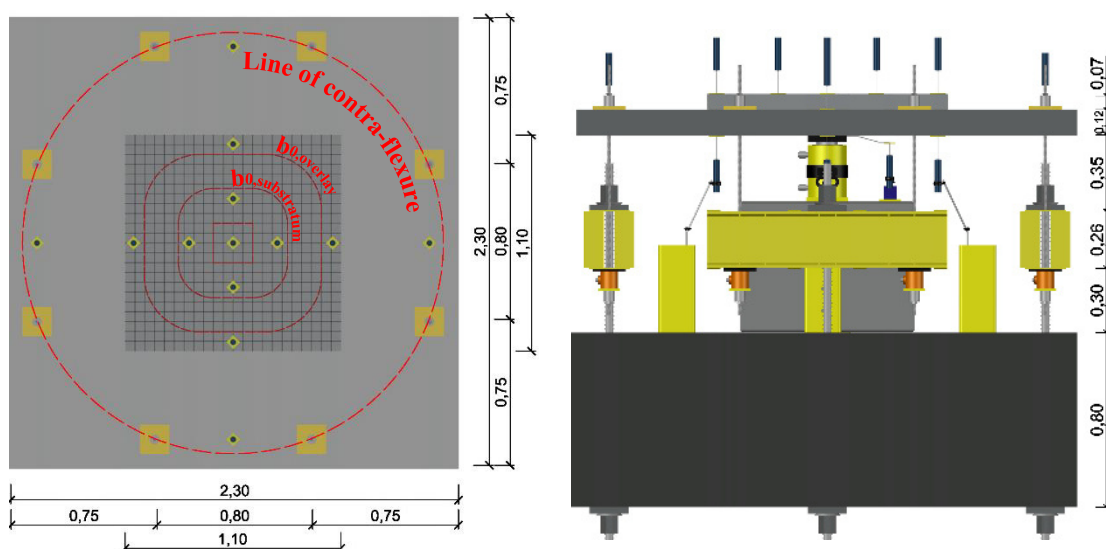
Test layout dimensions, top view (left) and side view (right) – S<sub>3D</sub> specimens.
